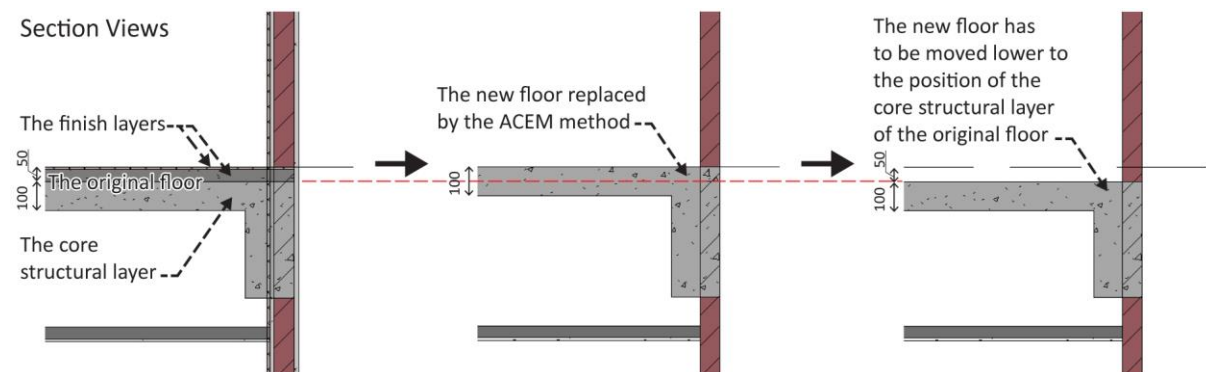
The position of the core structural layer of the new floor is higher than that of the core structural layer of the original floor; therefore, the new floor must be lowered.
